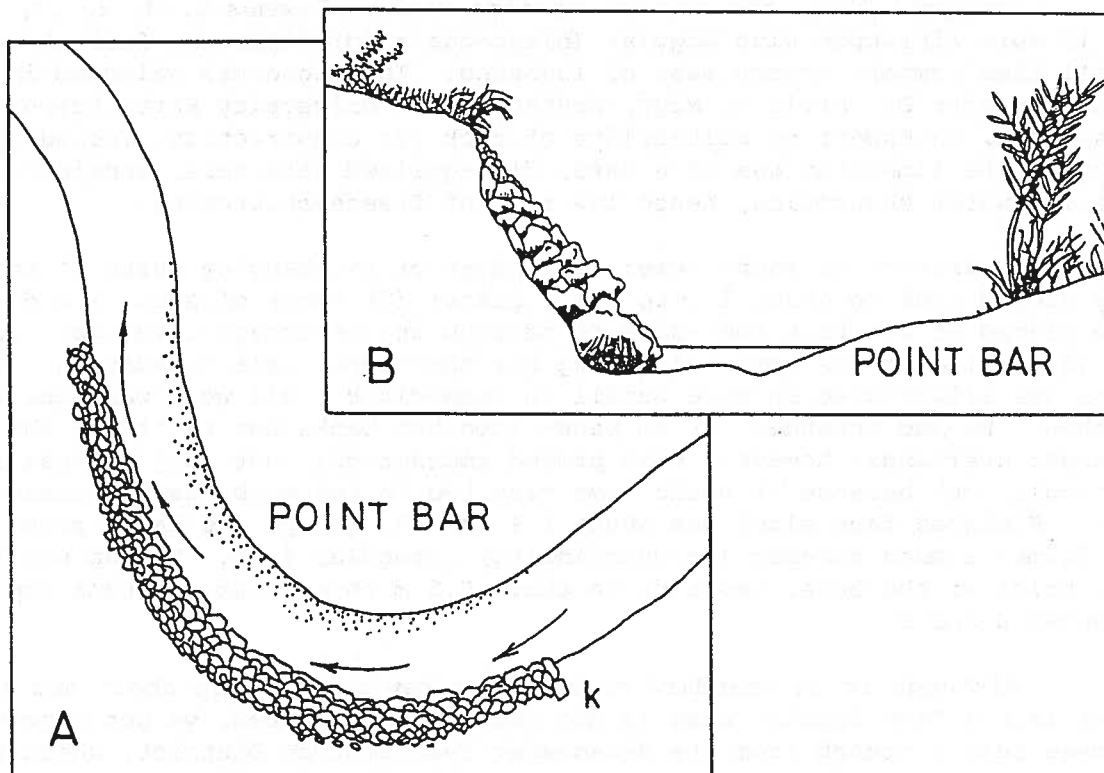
(A) Typical stream bend after installation of riprap. At upstream end of riprap (k), large rocks are key-trenched into the bank. (B) Cross section of riprap revetment with "foundation" rocks (typically greater than 1 m diameter) at base of the blanket. Typical talweg depth was 25-30 cm at "normal" low flow (285 L/s).
